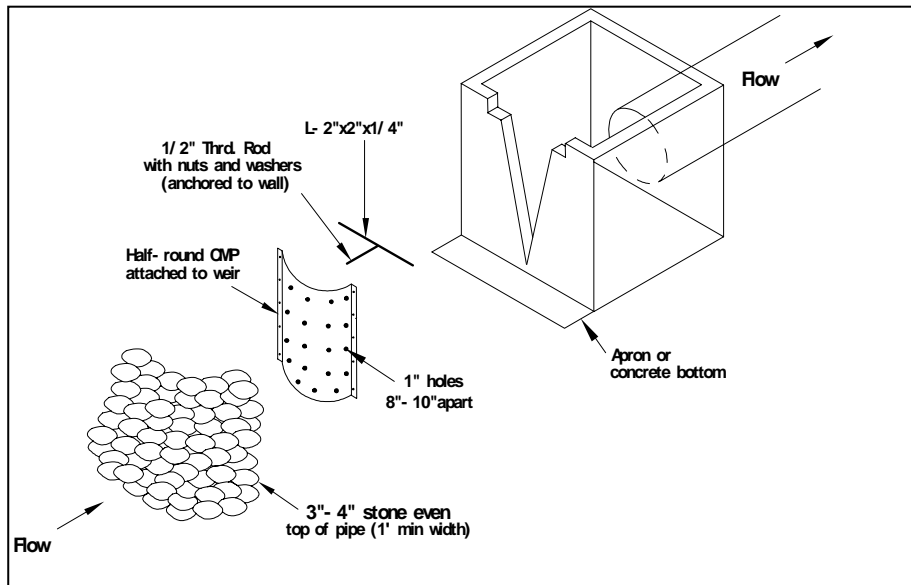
Perforated Half-Round Pipe Retrofit with Stone Filter Installation Requirements
